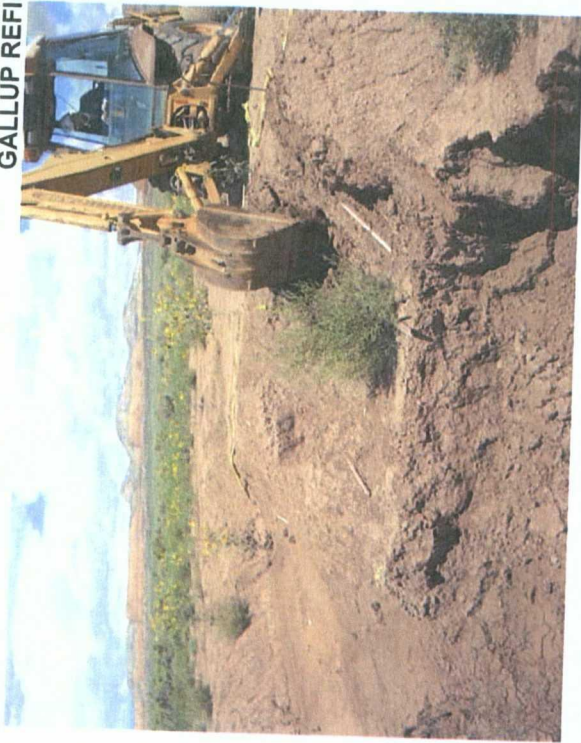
Collecting Confirmation Soil Sample CS-32, looking north
